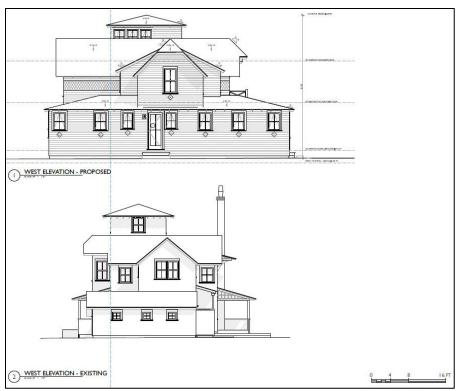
06.14.2022, West Elevation, Existing and Proposed (sullivan + associates architects).
